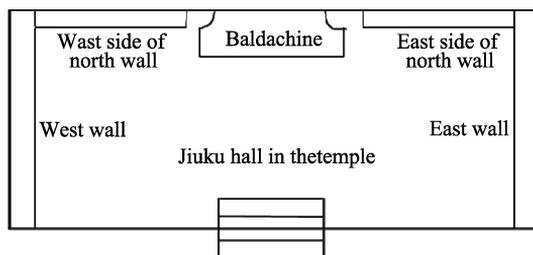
Distribution map of the four walls (east wall, east side of north wall, west side of north wall and west wall) of Jiuku Hall in the Temple
